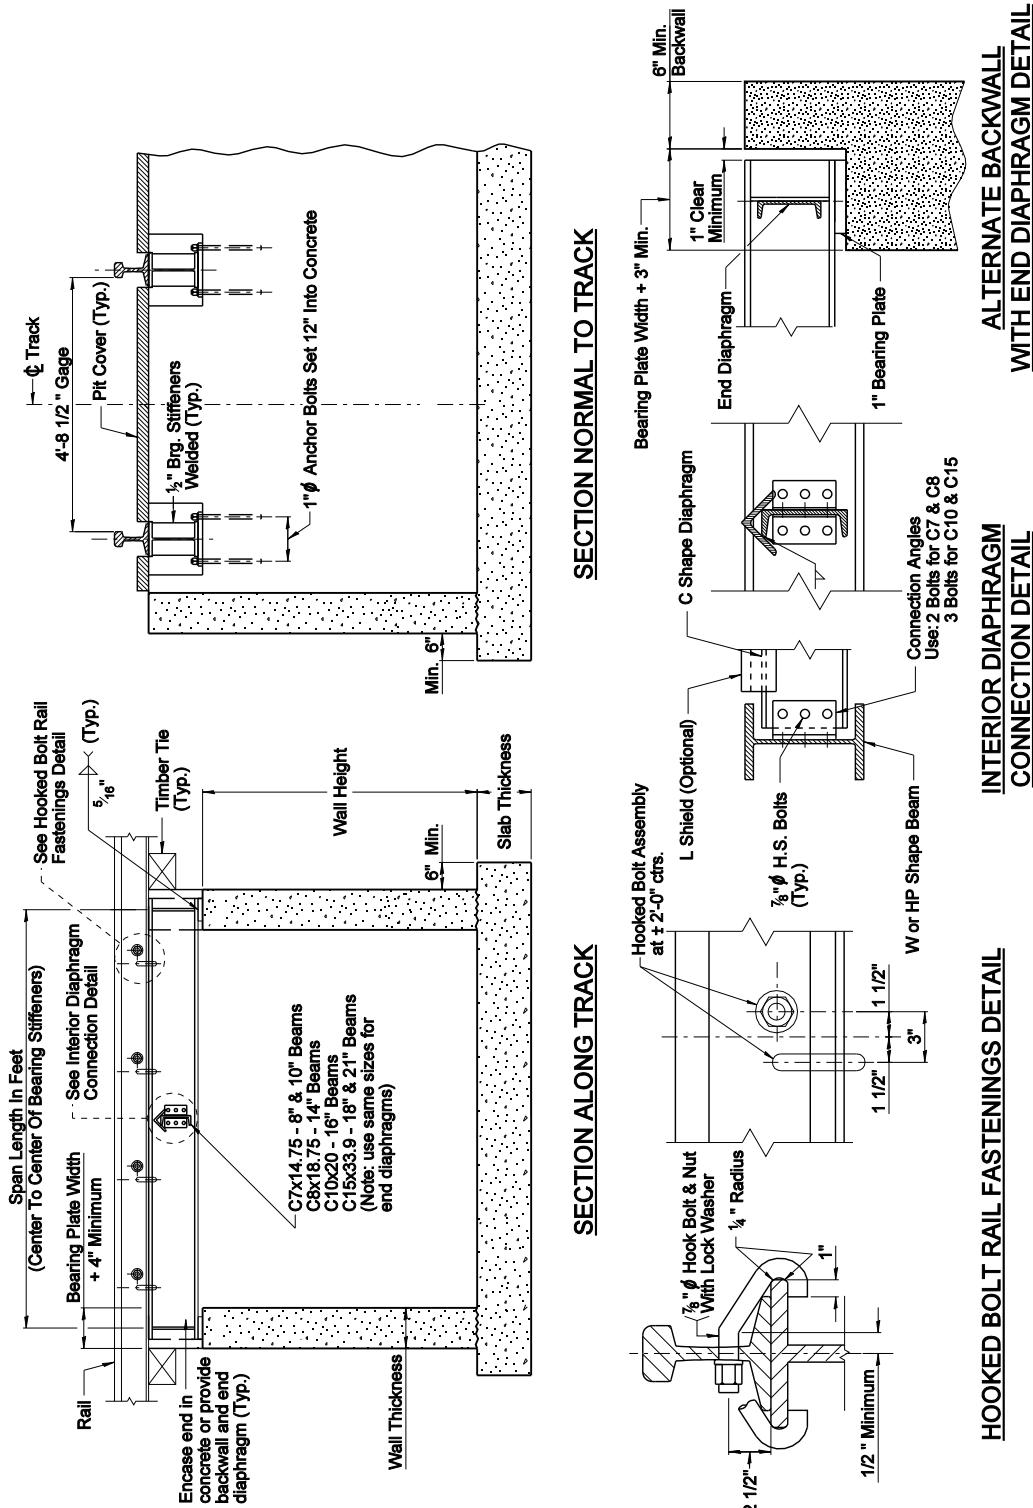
Unloading Pit – Fifteen Foot Maximum Span
